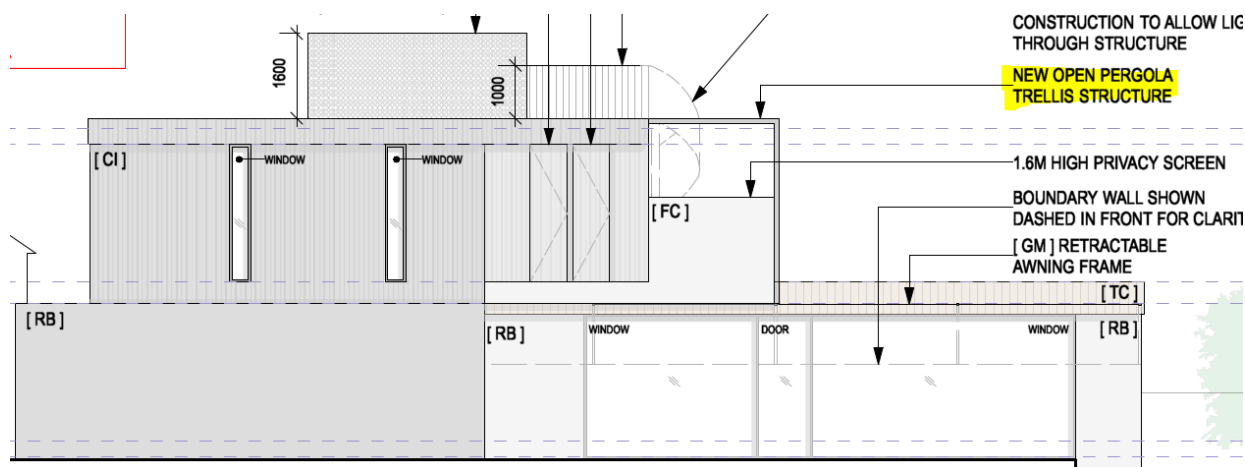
Proposed Open Pergola Trellis Structure to Northern portion of proposed first floor addition to subject site.
